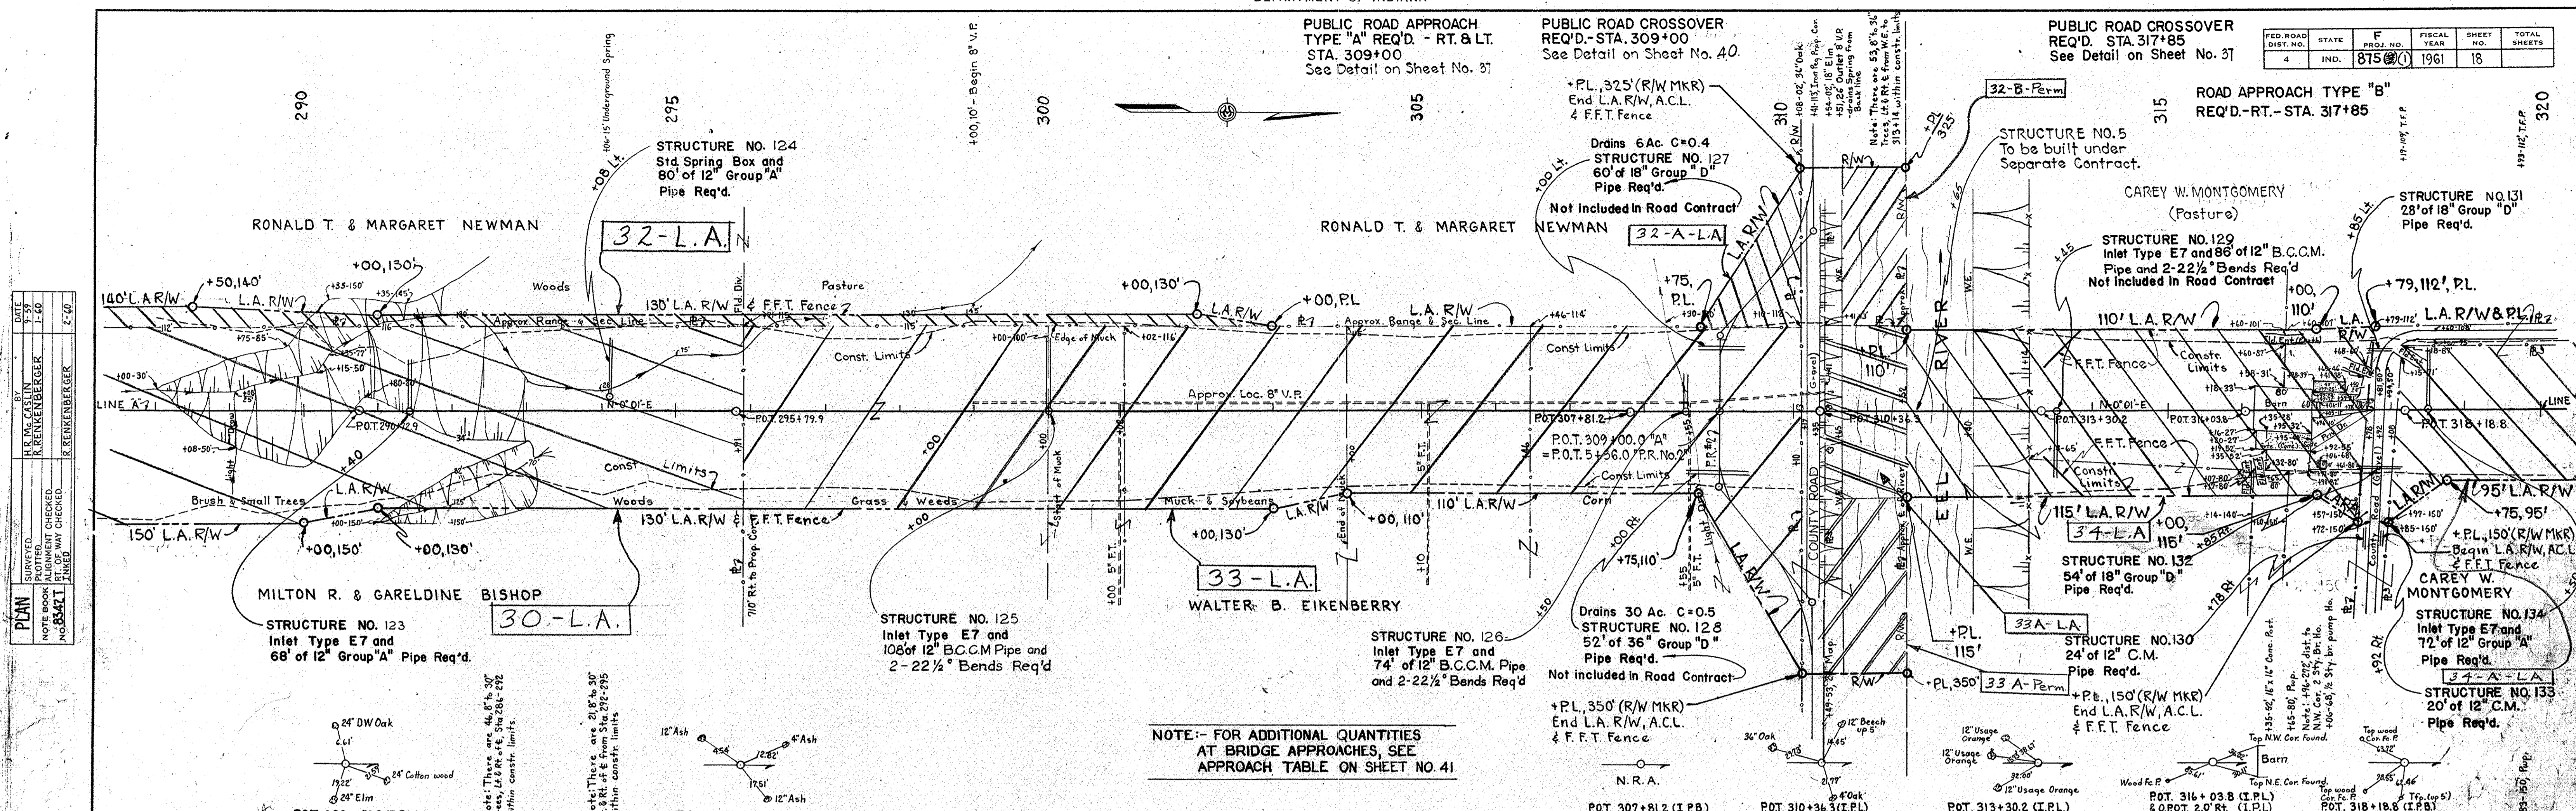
PLAN - PROFILE U. S. STANDARD
